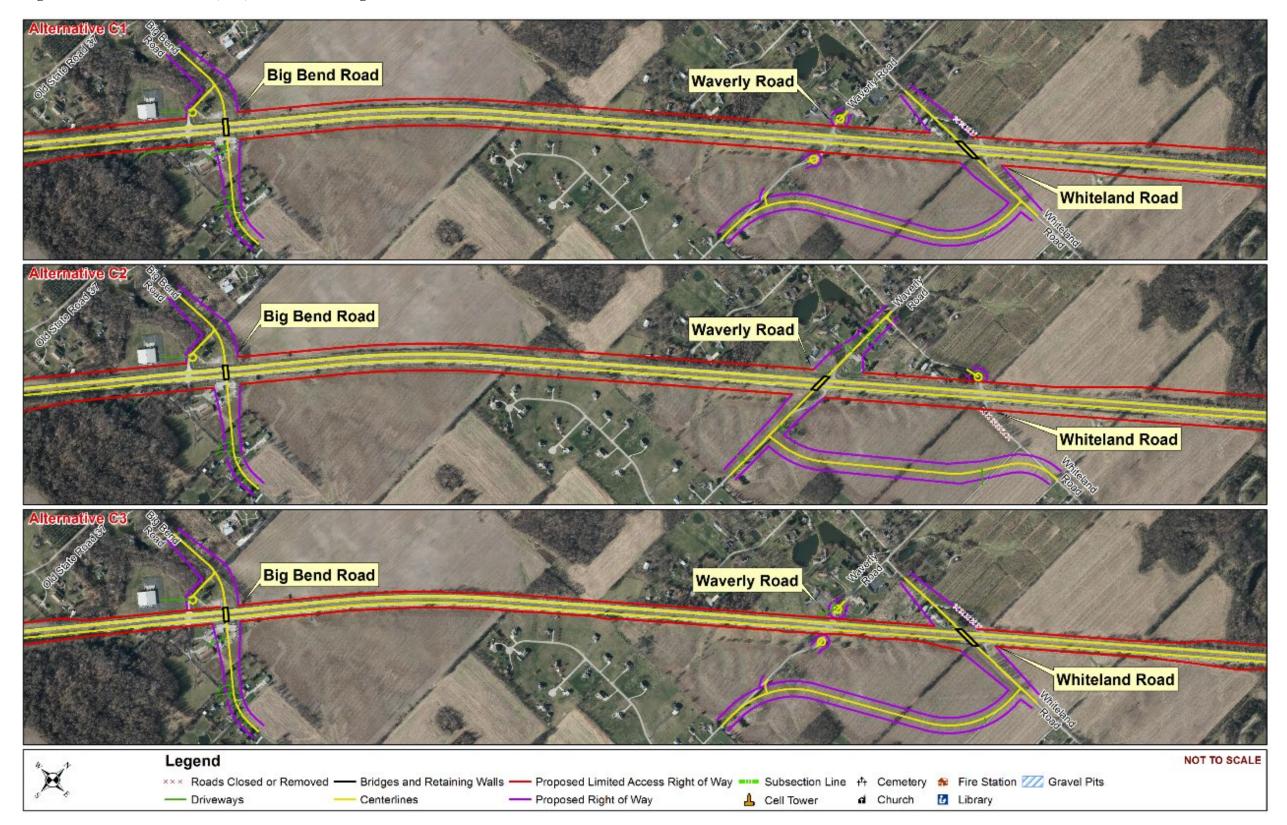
Alternatives C1, C2, and C3 from Big Bend Road to Whiteland Road
